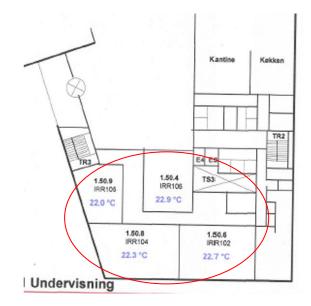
Education rooms on the first floor conditioned by Vent7.
